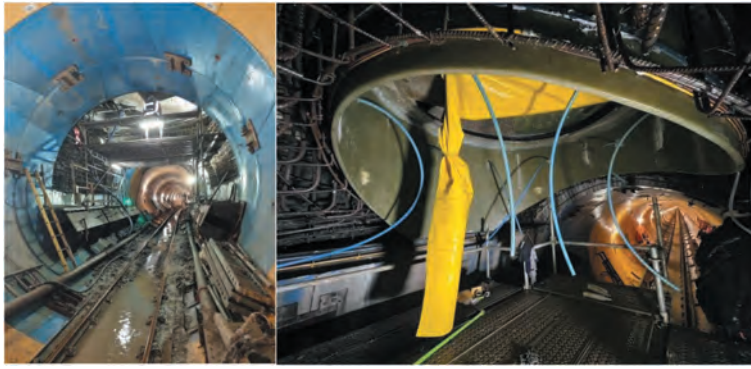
Photo of tunnel opening at PS23(left) and Keith Hay Park (right).
